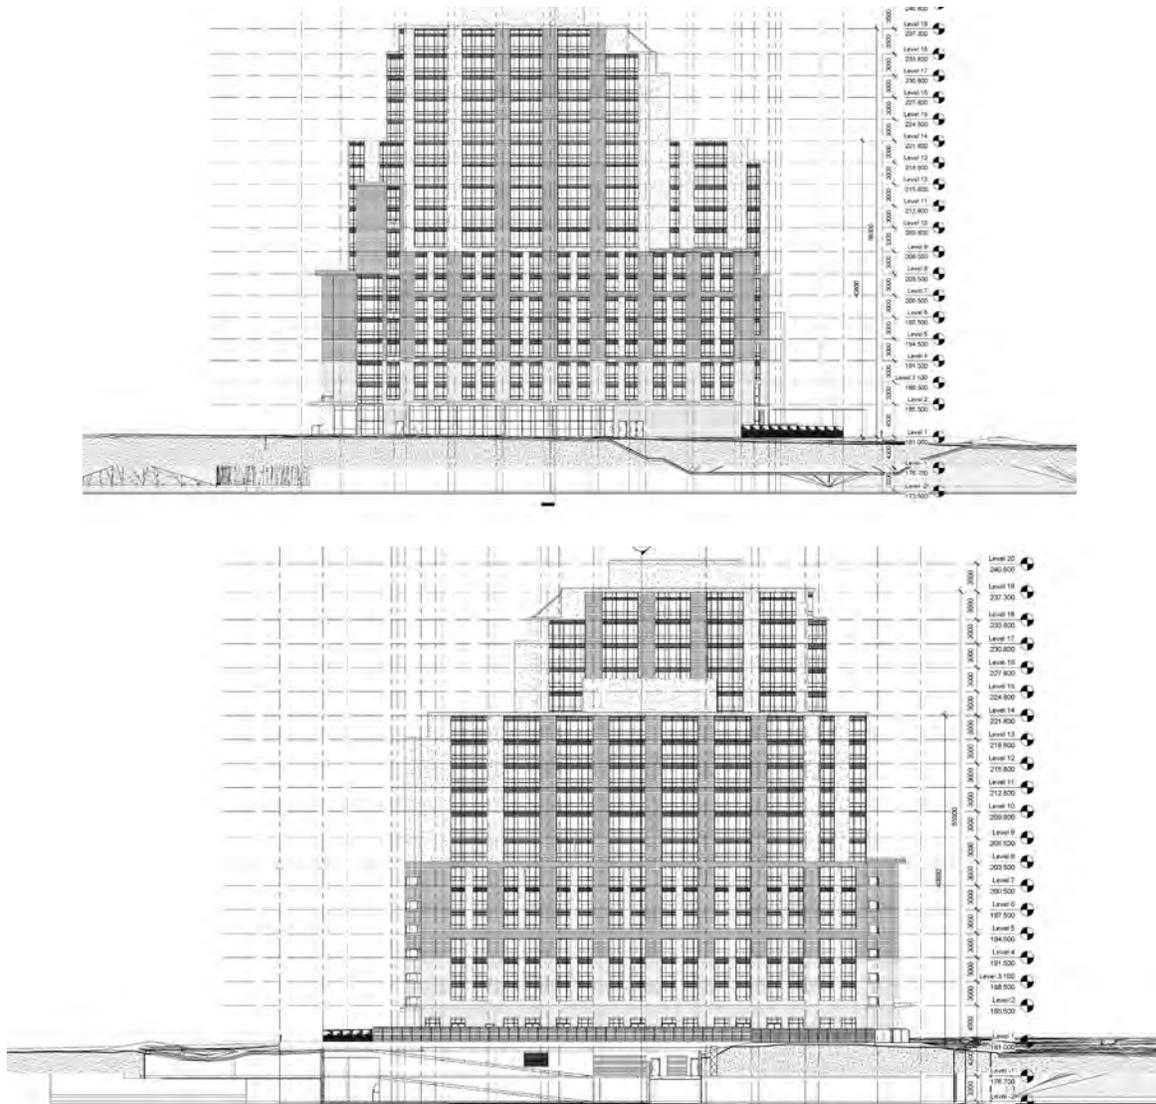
NORTH (TOP) AND SOUTH (BOTTOM) ELEVATIONS
